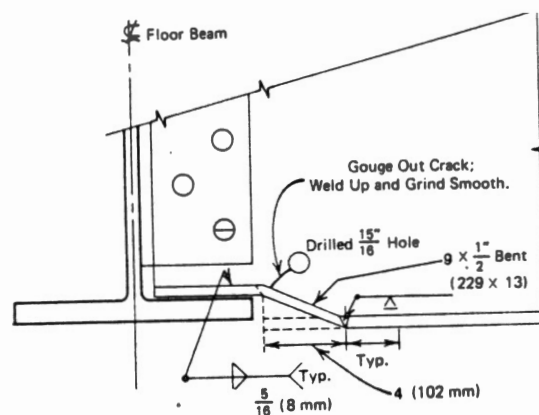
Retrofit Detail Showing Reinforcement of Cross Section (2)
